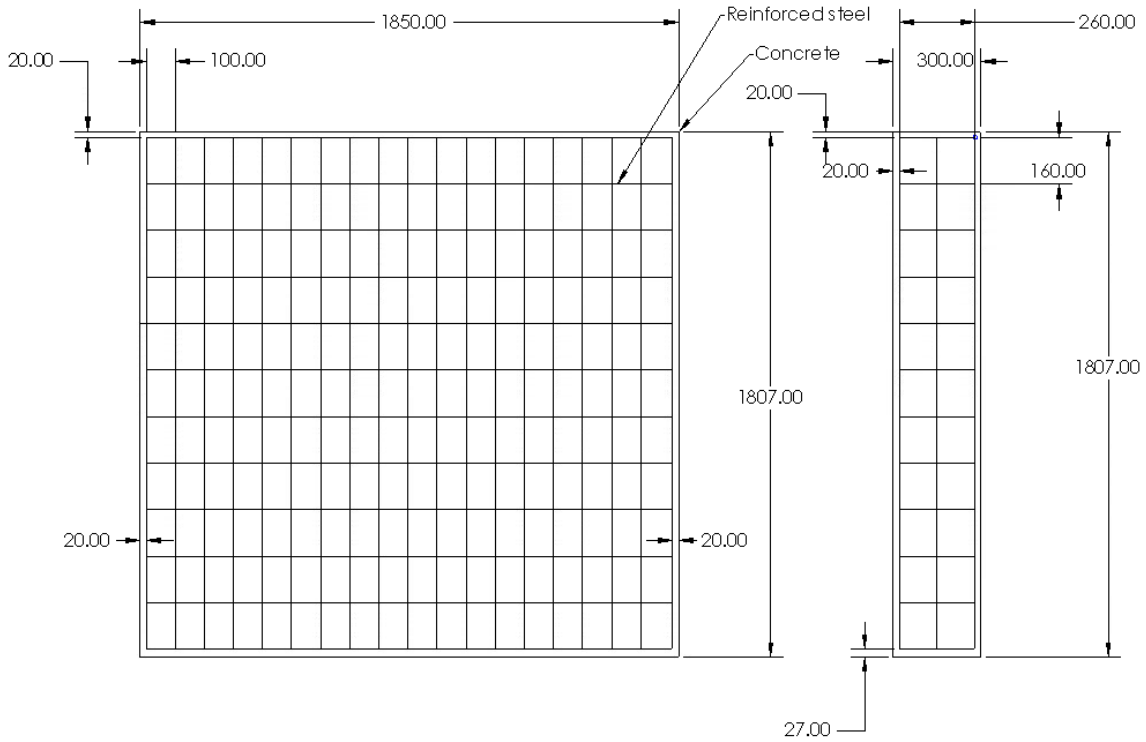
2D Drawing of Reinforced Concrete Wall (Dimensions are in mm).
